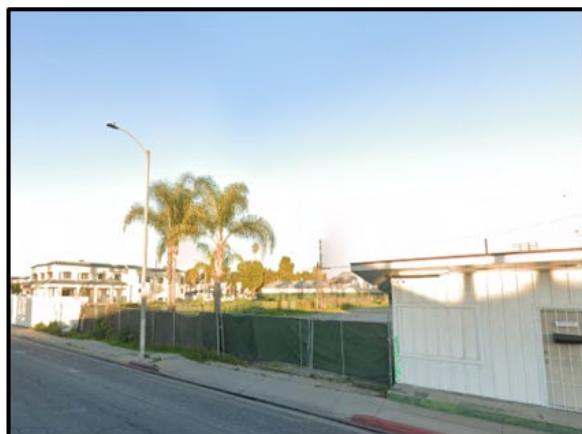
View looking at the southern portion of the project site along Pioneer Boulevard.
